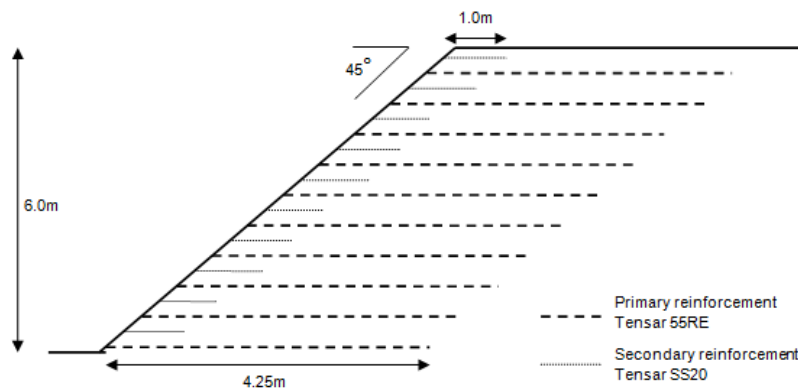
Reinforced earth slope design (image taken from Hughes et al., 2006)
